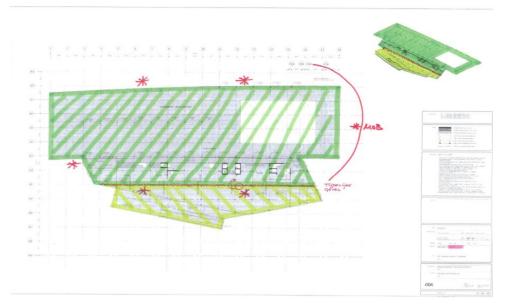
Ground floor and crane positioning for the new Delft train station and City Hall
